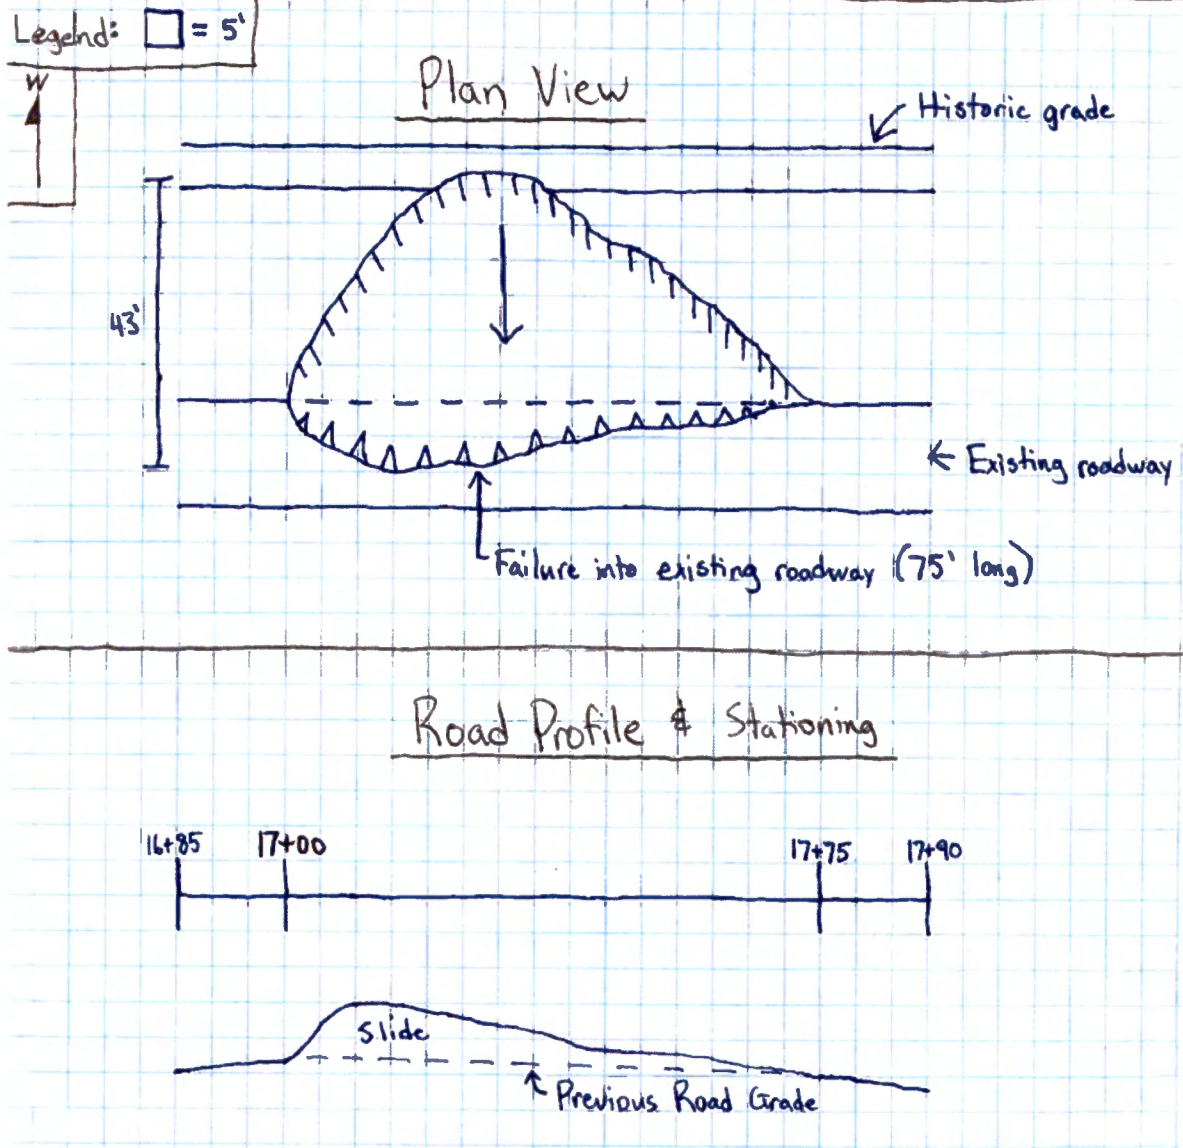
Plan view and profile of reconstruction at cutslope failure.
